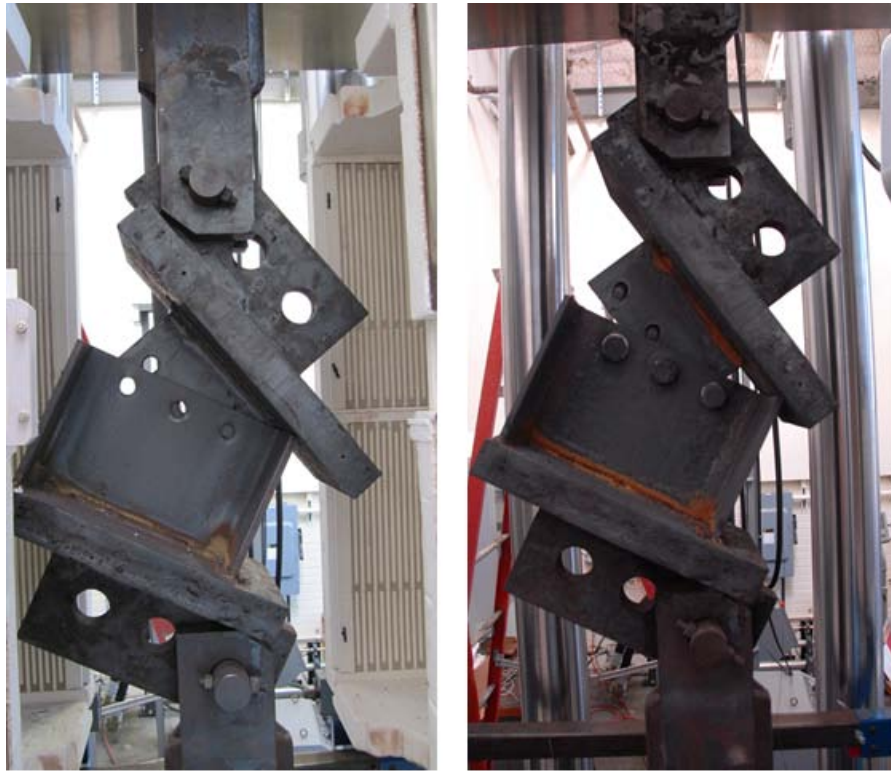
Connection failures after inclined tension tests at 500°C (left) and 700°C (right) – 3/4 inch A325 bolts
